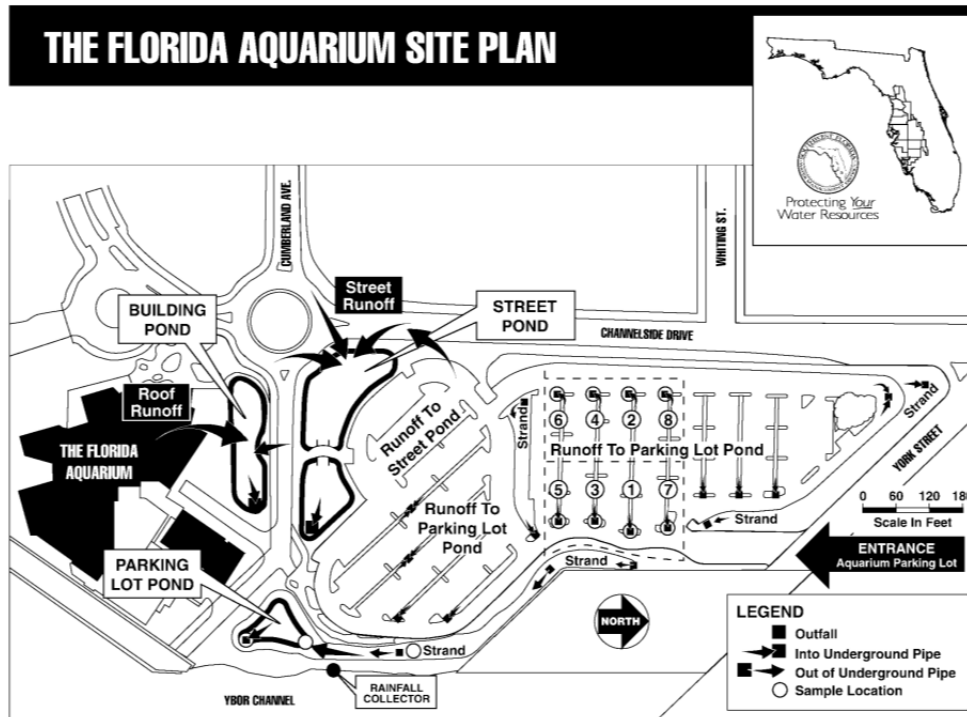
Florida Parking Lot Study Site. (Rushton, 2001)
